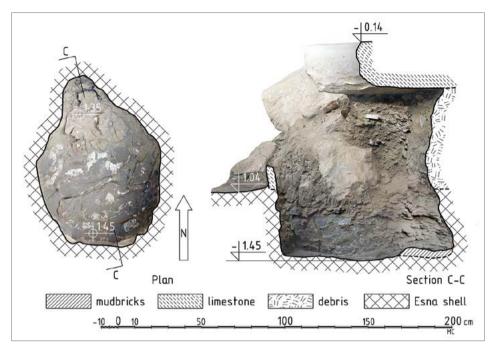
Plan of the bottom and section of the southwestern foundation pit (IFAO/PCMA UW/photogrammetry M. Caban)
